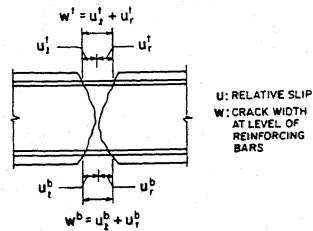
DEFINITION OF RELATIVE SLIP AND CRACK WIDTH AT A CRACKED REINFORCED CONCRETE SECTION
